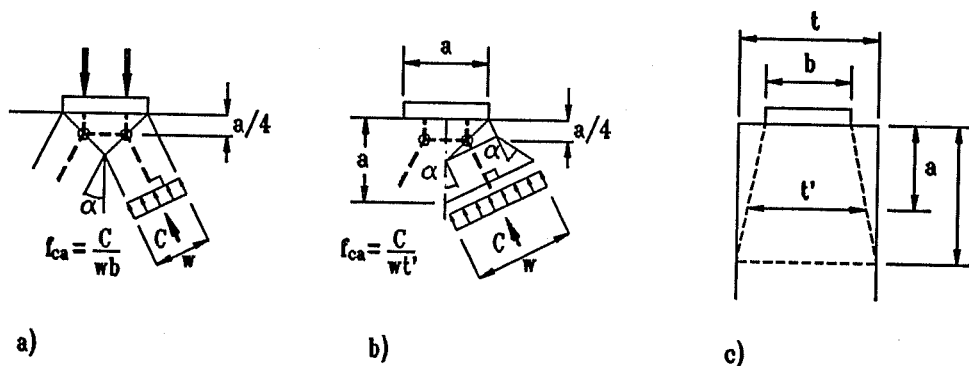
Critical Section for Compression Struts in Anchorage Zones
